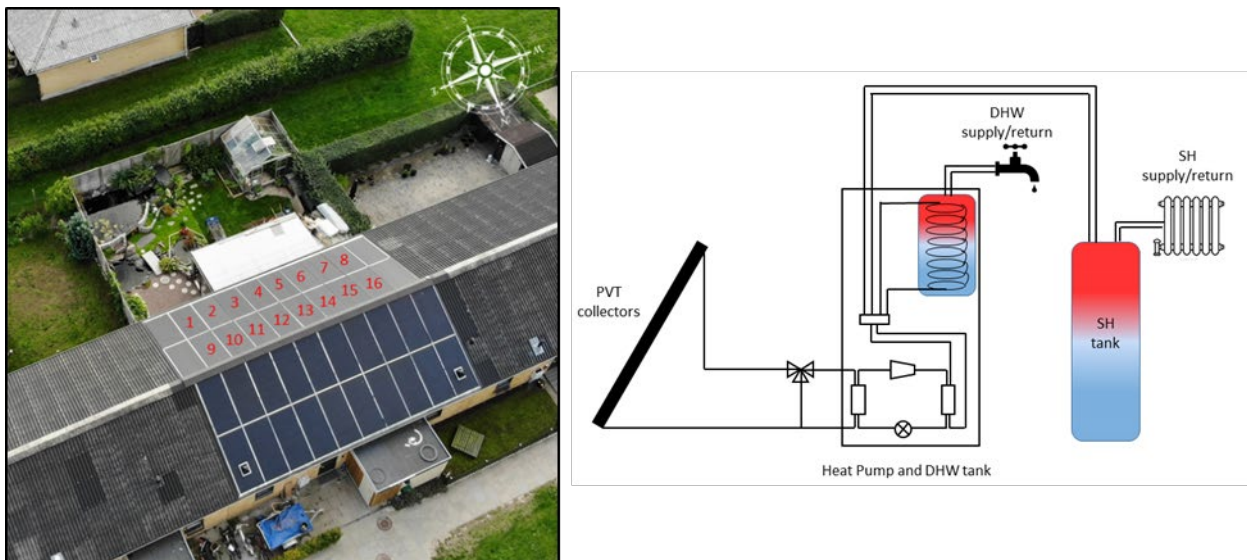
Aerial photo of the roof integrated PVT panels and schematic sketch of the system.
